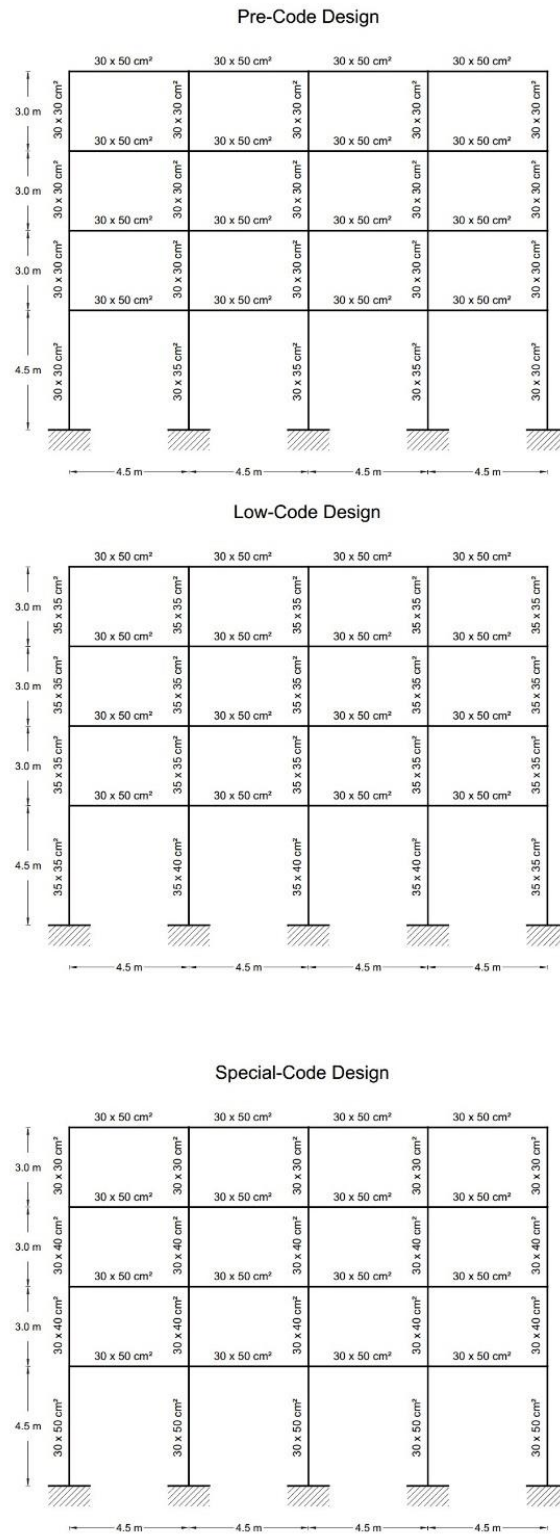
Elevation dimensions and members cross-sections of the considered RC frames.
